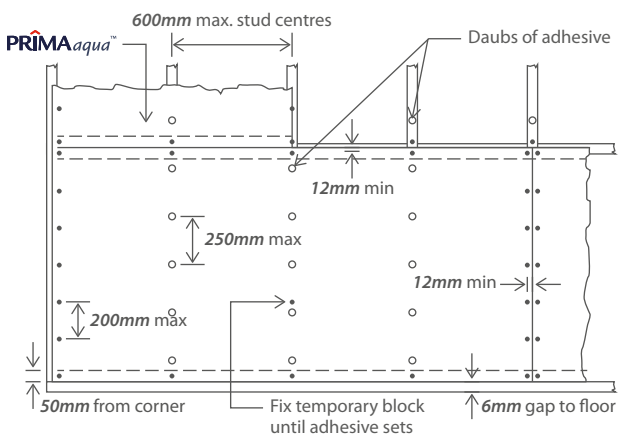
Adhesive and Fastener Fixing (Untiled Wall)
